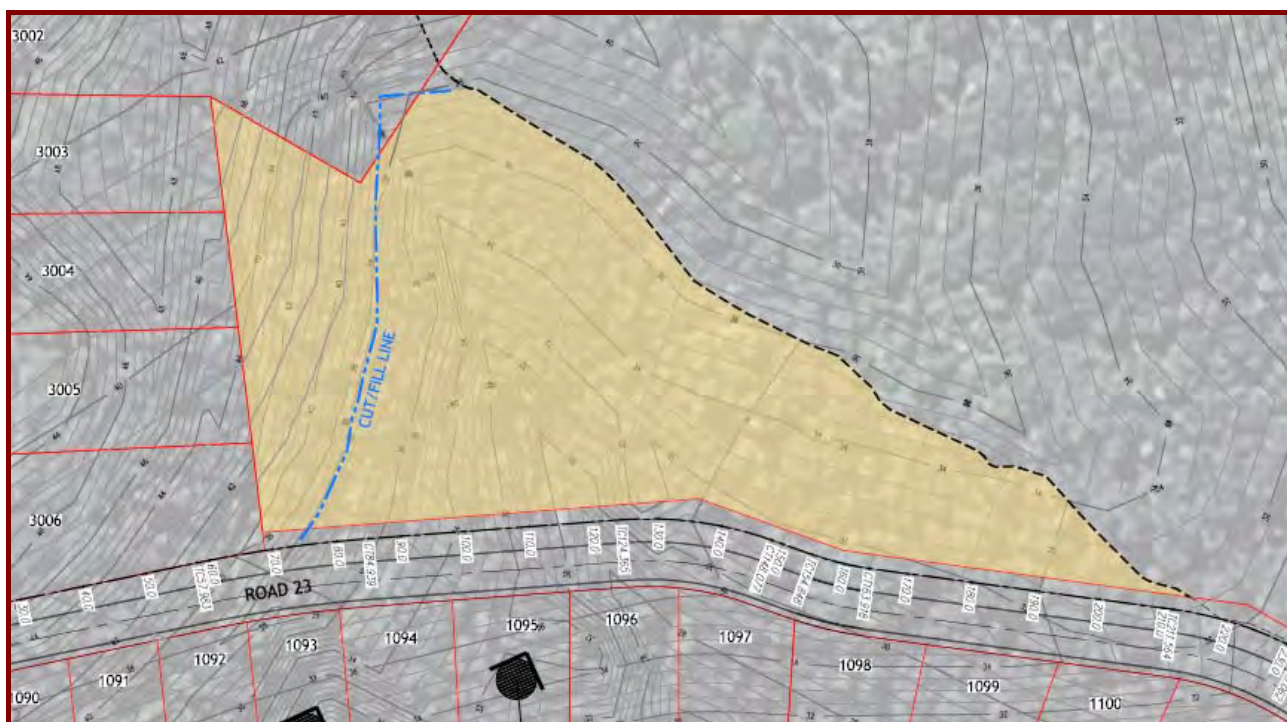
Extent of fill on adjoining land required to build Road 23 as approved.
